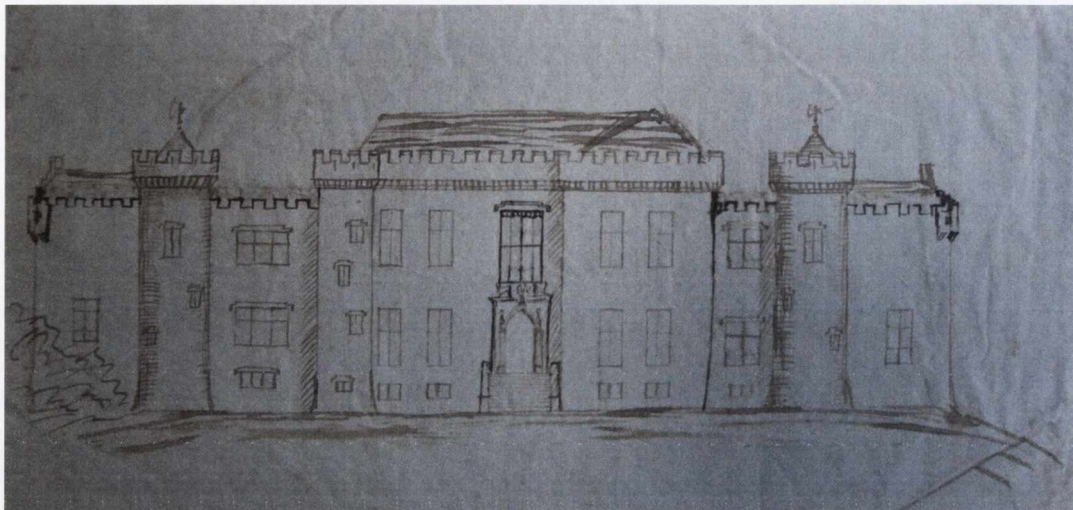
Birr Castle, proposed north elevation, attrib. to Laurence Parsons, [1802–1803], Rosse papers, O/17/9.
